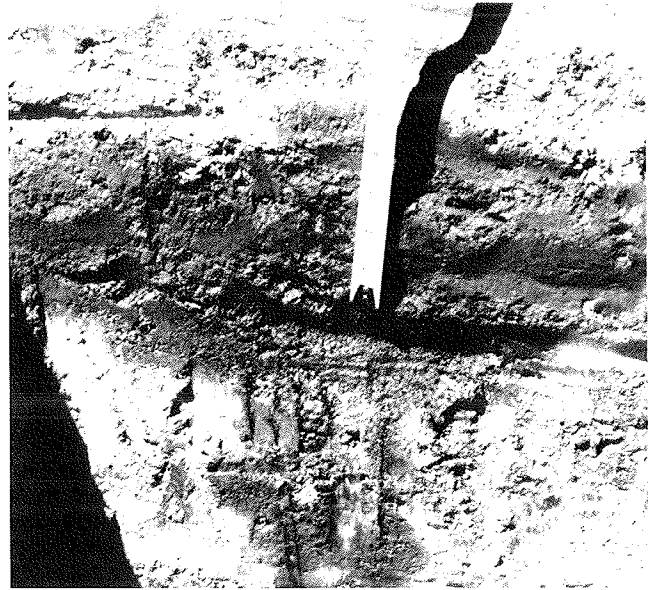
Soft damp material sandwiched between dense asphalt concrete layers.
